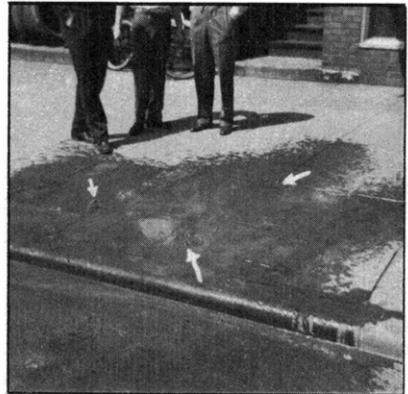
This is a view of a service line break. The water is gushing up through holes in the sidewalk. Shortly after this picture was taken the water was shut off. Inside the building were film developing tanks with submerged inlets and other plumbing defects from which waste water was probably siphoned into the water main.
